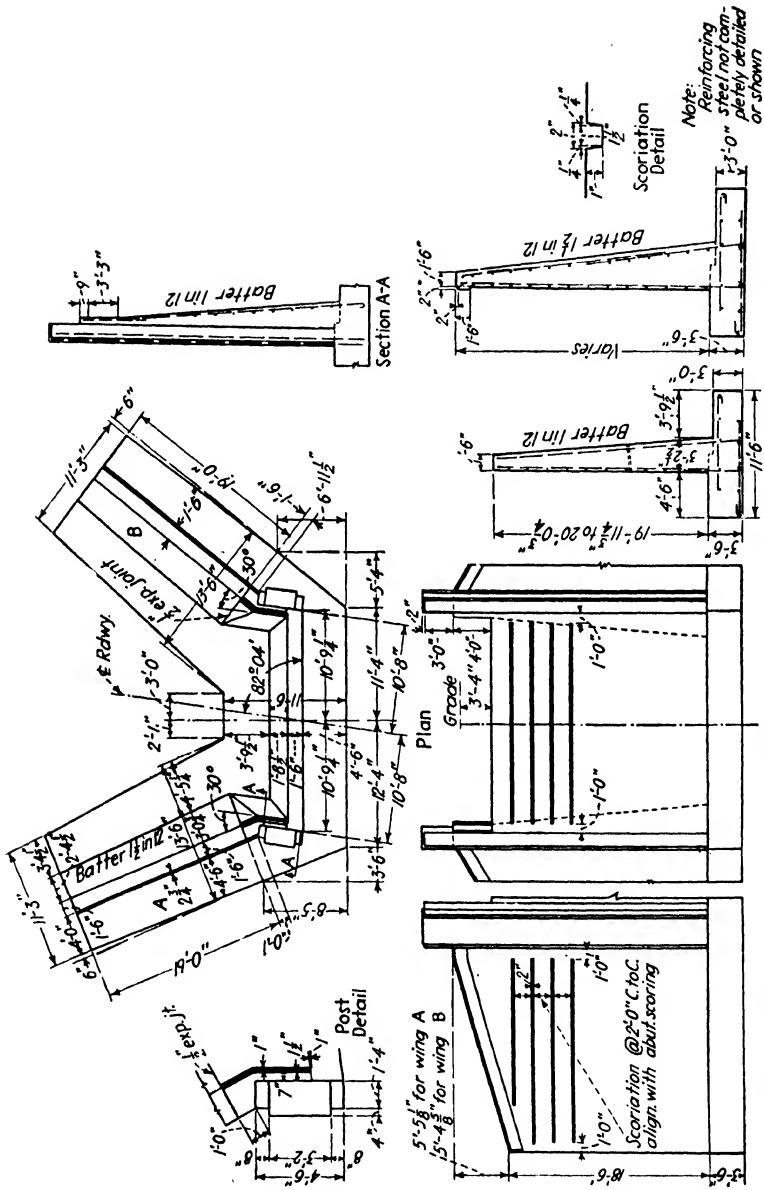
Cantilever Type of Abutment. (Courtesy of R. F. Graef, formerly Chief of Bridges, Pennsylvania Turnpike Commission.)
